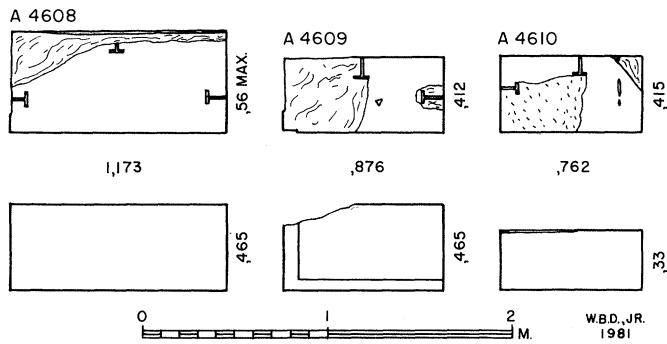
G 6-8: Wall blocks A 4608—A 4610
